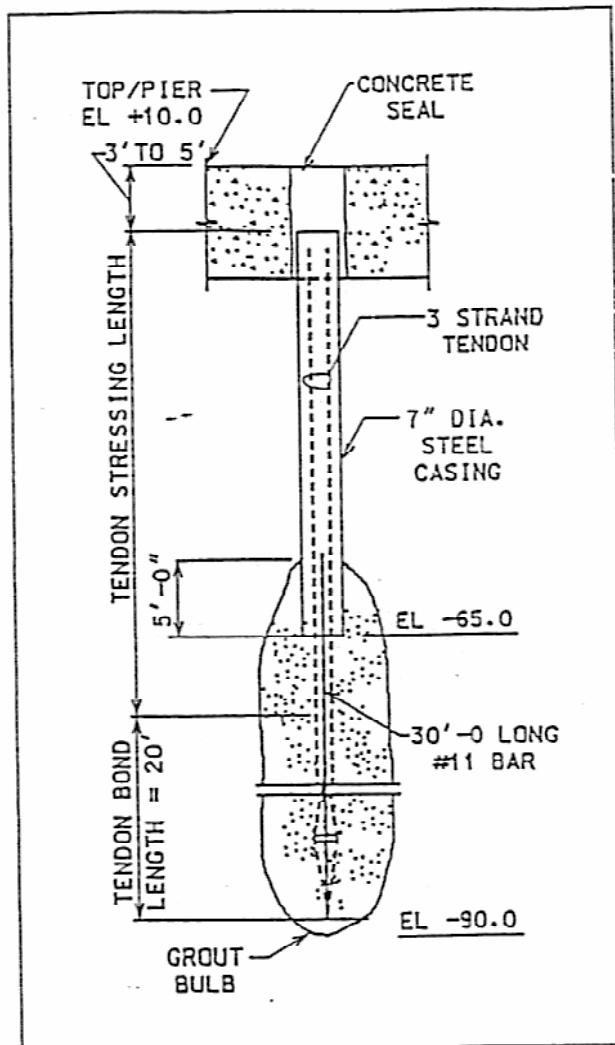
Typical detail of preloaded pinpile, Pocomoke River Bridge, MD (Bruce et al., 1990).
